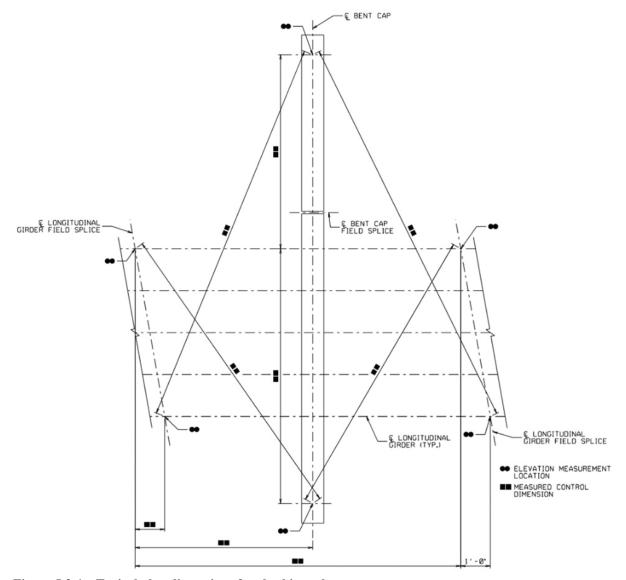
Typical plan dimensions for checking tolerances
